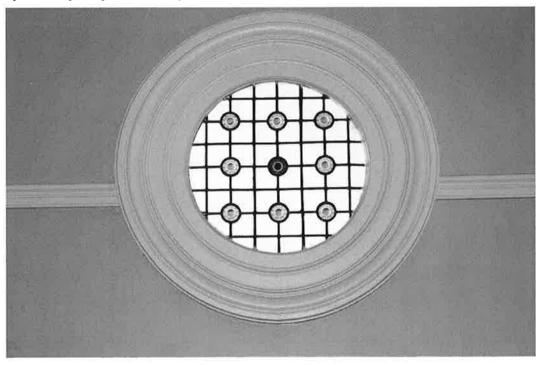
Detail of glass to bullseye window, ground floor east elevation
